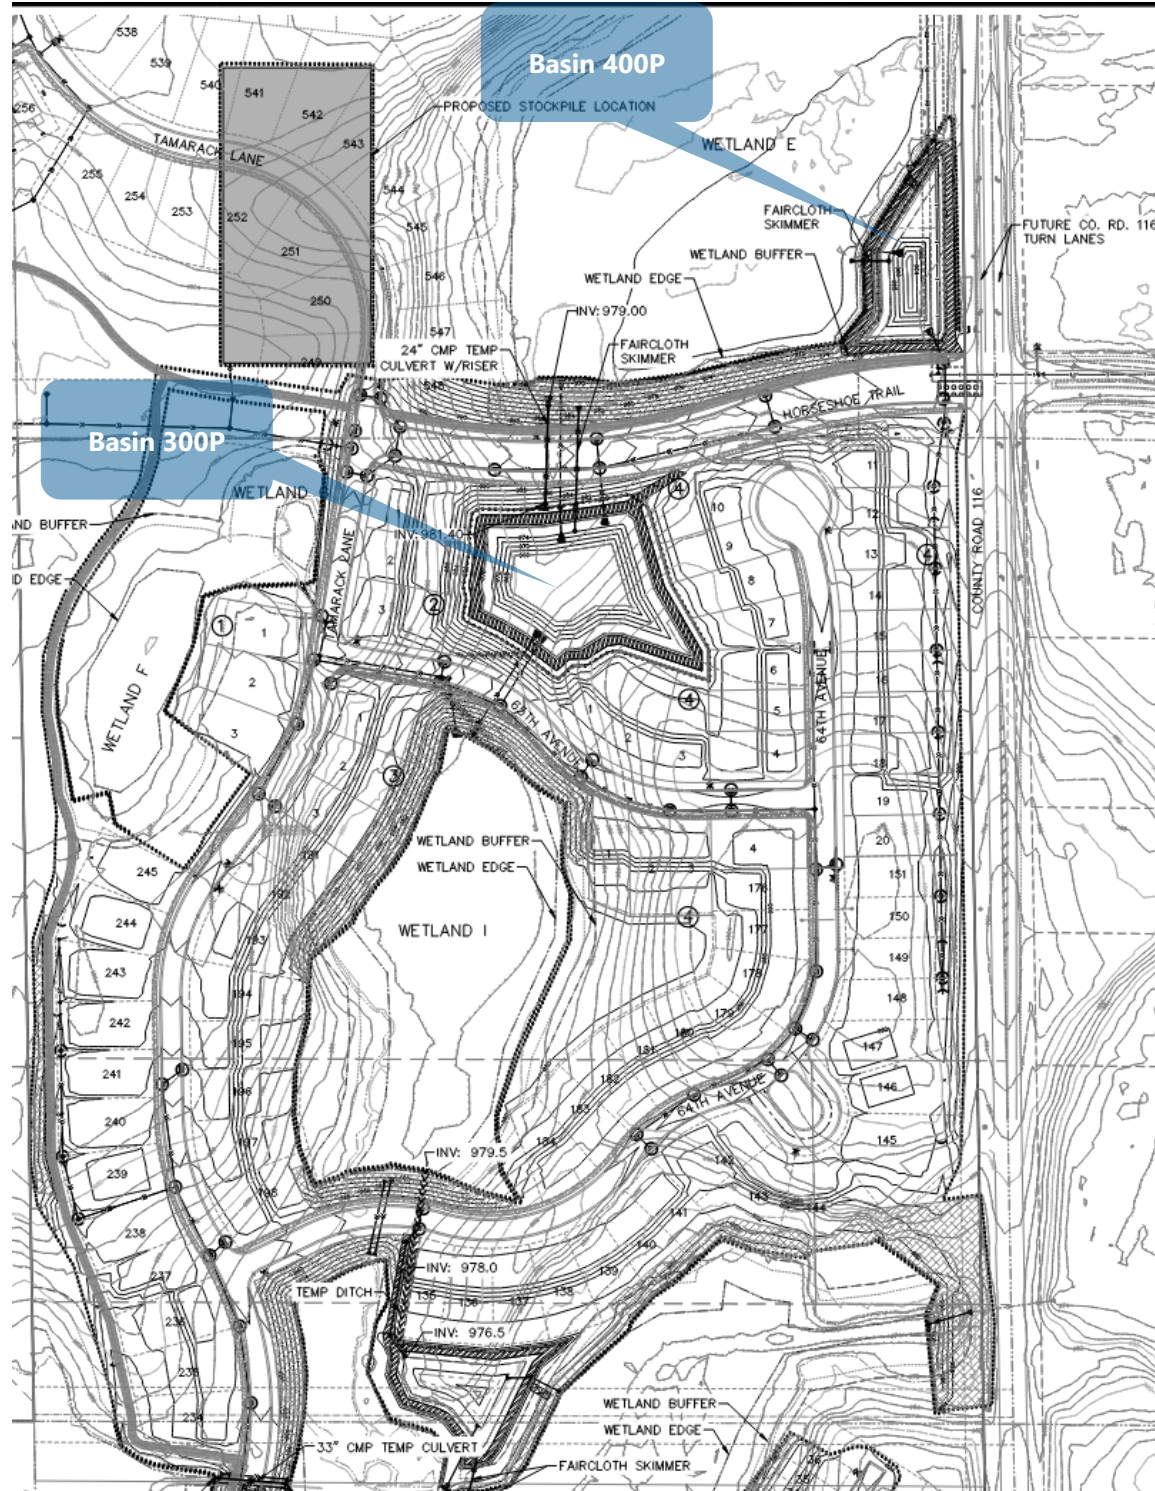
Phase 1 Grading Plan – North Stormwater Basins
